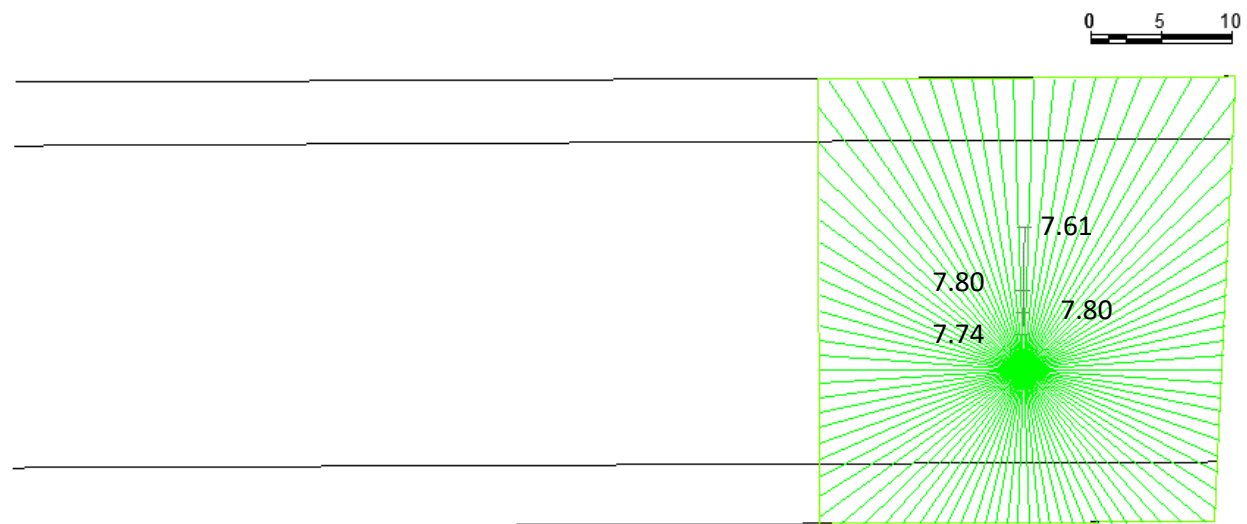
True long view of the 16N Stope hanging wall after Blast 12 showing the ERF calculation for anchor 6.
